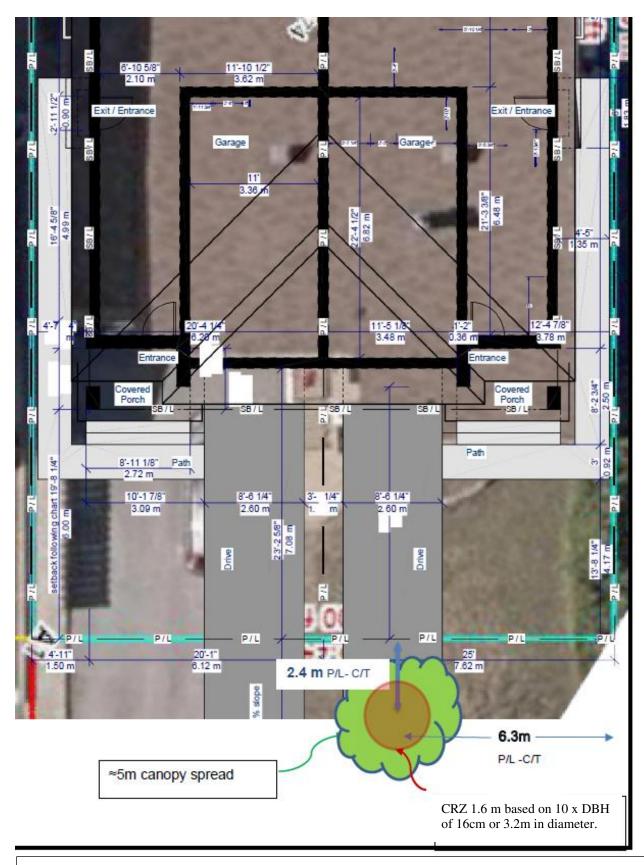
Shows Tree No. 1 C/T (Centre of Trunk) in relation to the P/L (Property Line). CRZ is highlighted in red. New construction foot print superimposed over existing building foot print supplied by Catalli Inshaw Design.
